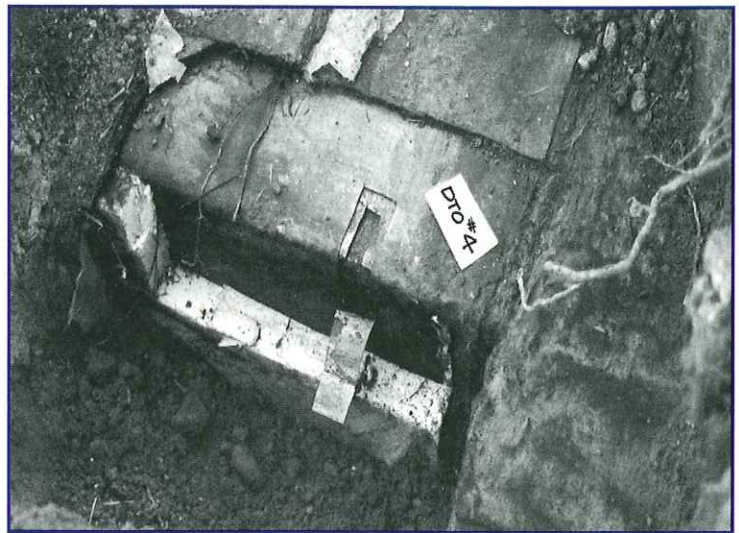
Destructive test opening (DTO) through a plaza deck.
